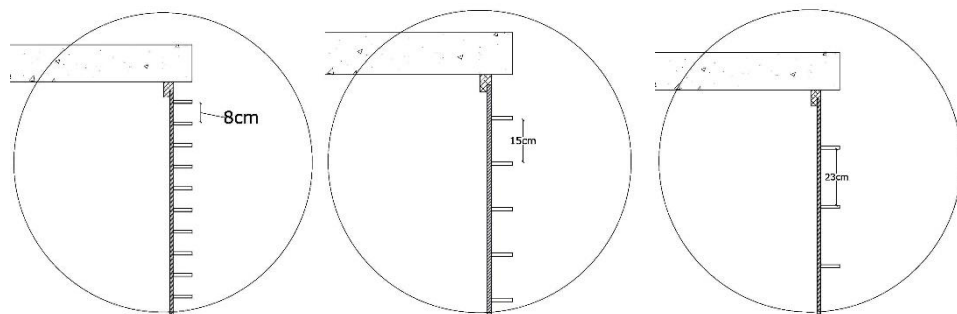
Blow up sections of horizontal louvers on west façade of existing case building having 8cm, 15cm and 23cm gap between each other respectively and perpendicular to the facade (from left to right).
